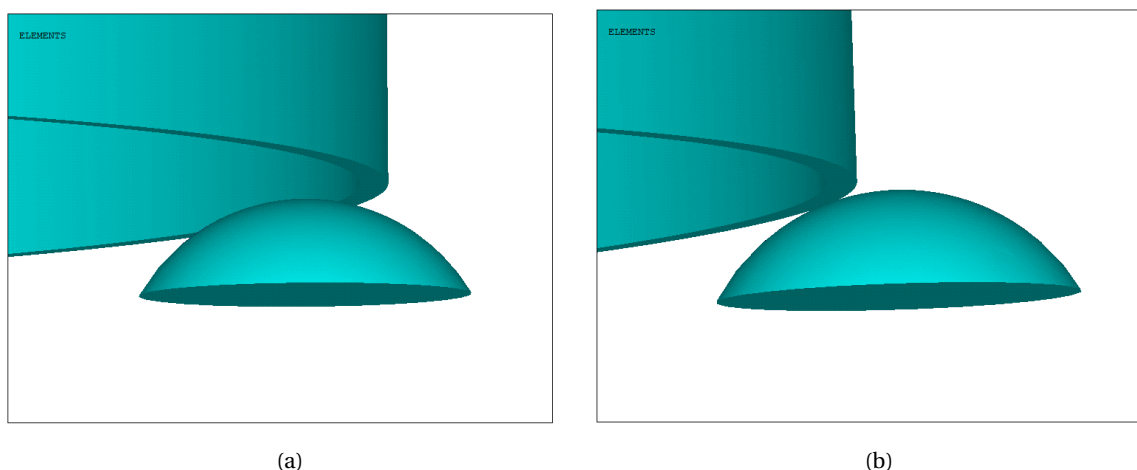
(a) Boulder's centre located inside the pile. (b) Boulder's centre located outside the pile.
